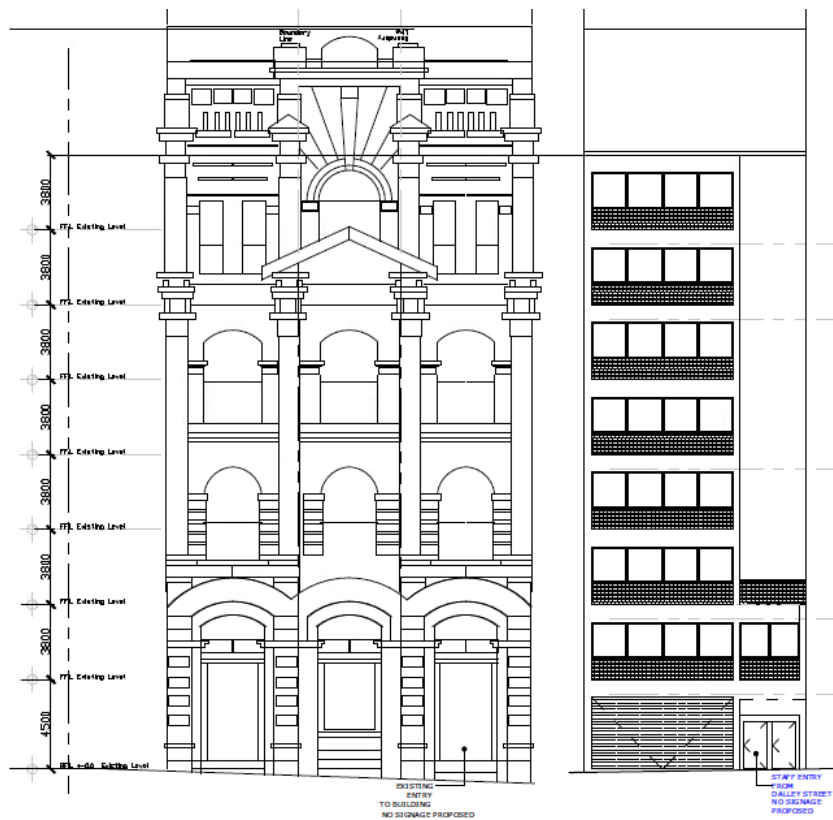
Proposed Bridge St (left) and Dalley Street (right) elevations
